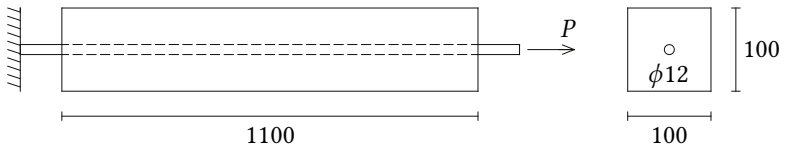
Test setup of the RC tensile member STN12 tested by WU et al. [124]. All dimensions in millimetres.
